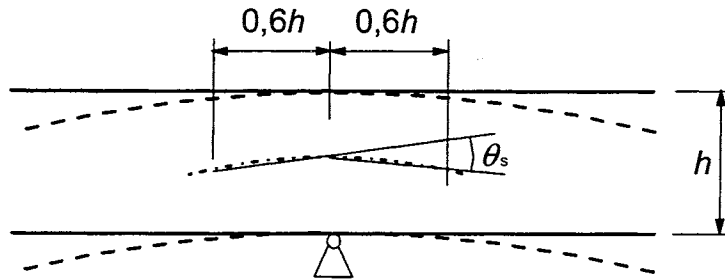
Plastic rotation θ_s of reinforced concrete sections for continuous beams and continuous one way spanning slabs.
